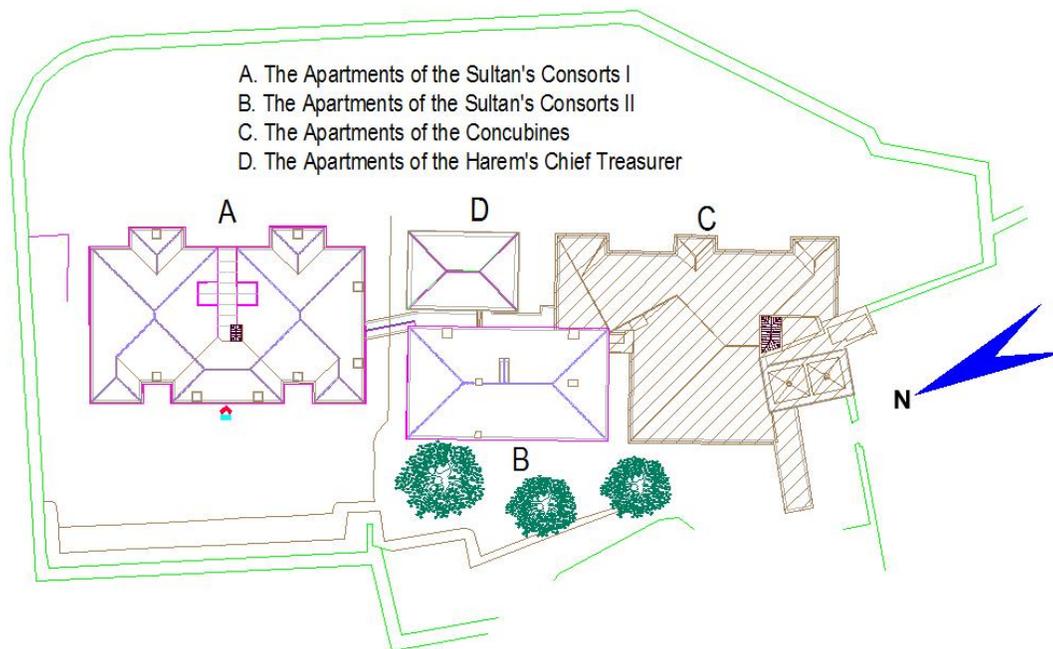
Site plan of the Harem Structures (Inkaya, 2009).
